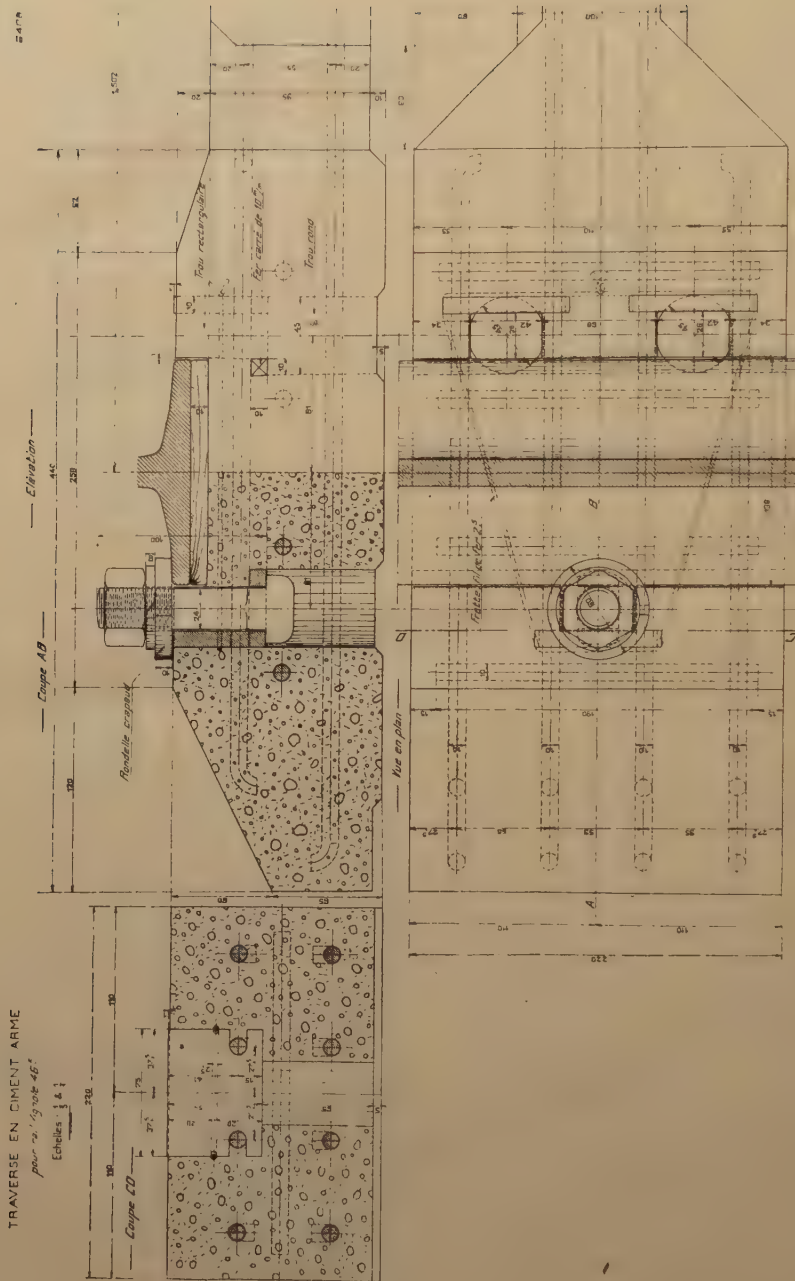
Ferro-concrete sleeper, T. R. C. P. type, with bolt and clip fastening. — Detail of fastening.
